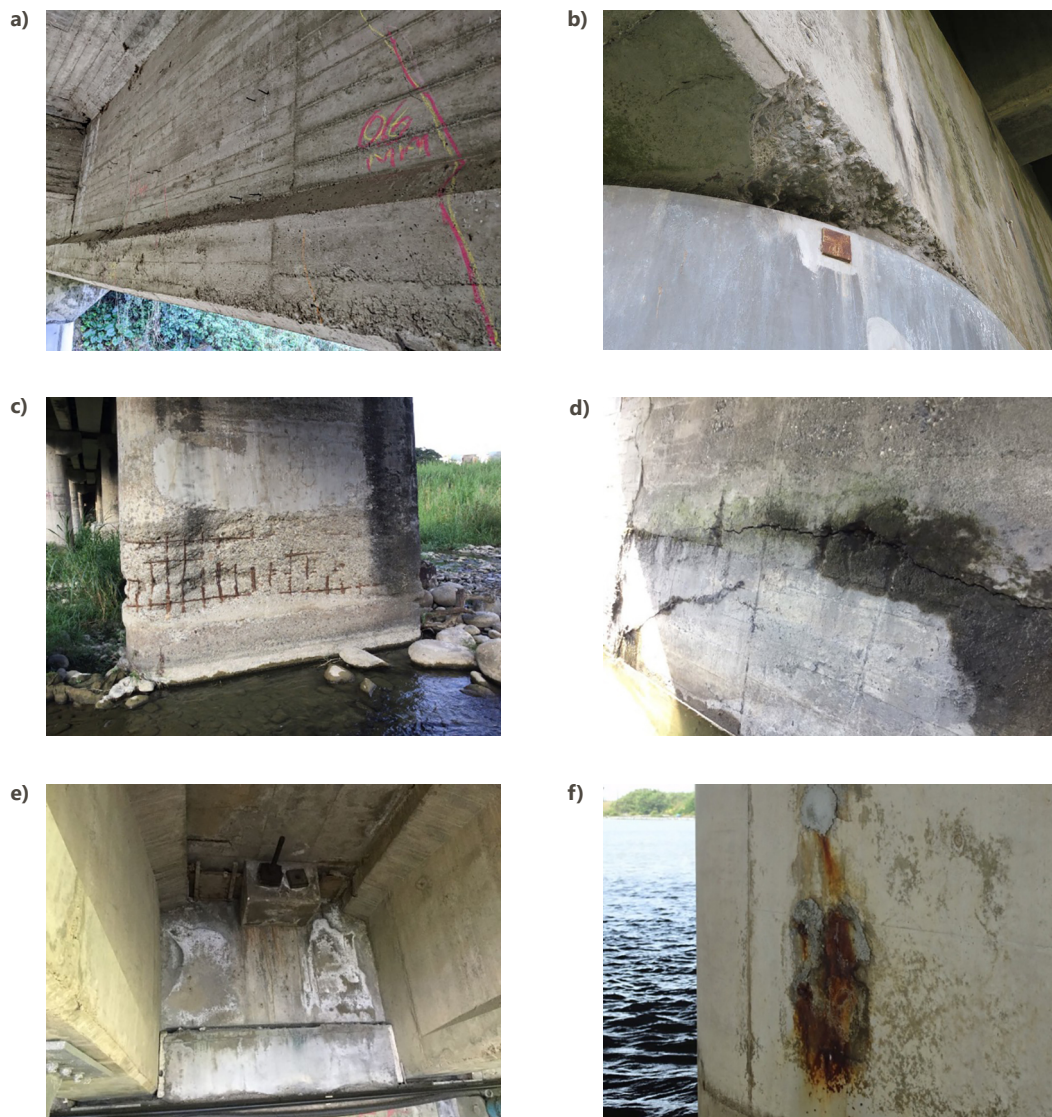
Typical deterioration patterns, with: a – structural crack; b – spalling; c – corrosion; d – infiltration; e – efflorescence; and f – rusty stain
